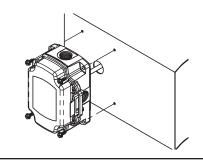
BAPI-Box (BB) Enclosure Mounting and installation Holes (Rotate 90° for Horizontal Mounting)
